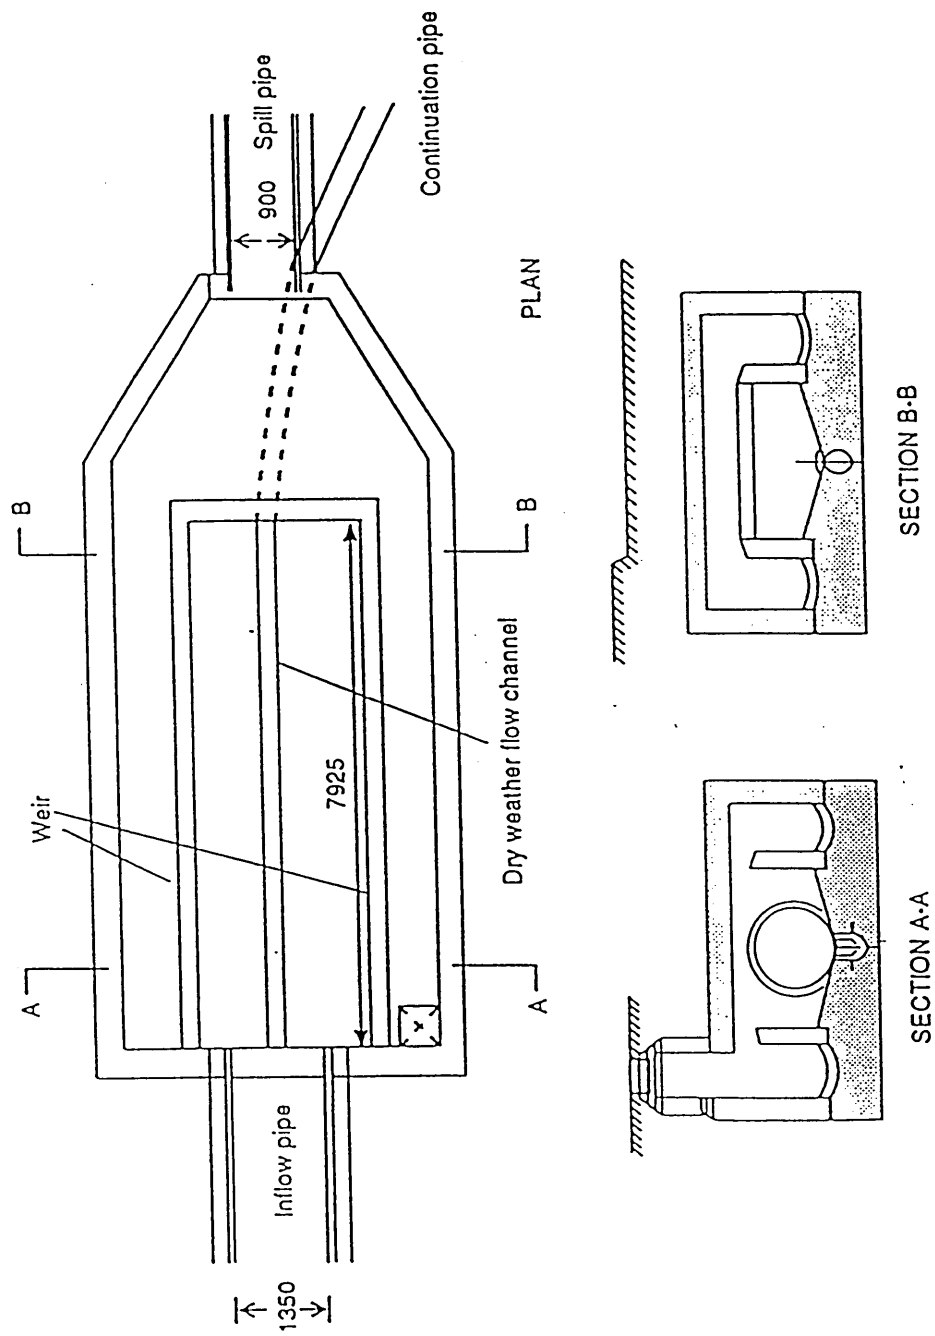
Plan and Cross-Section of the High Side Weir Site (Dobcroft Road)
